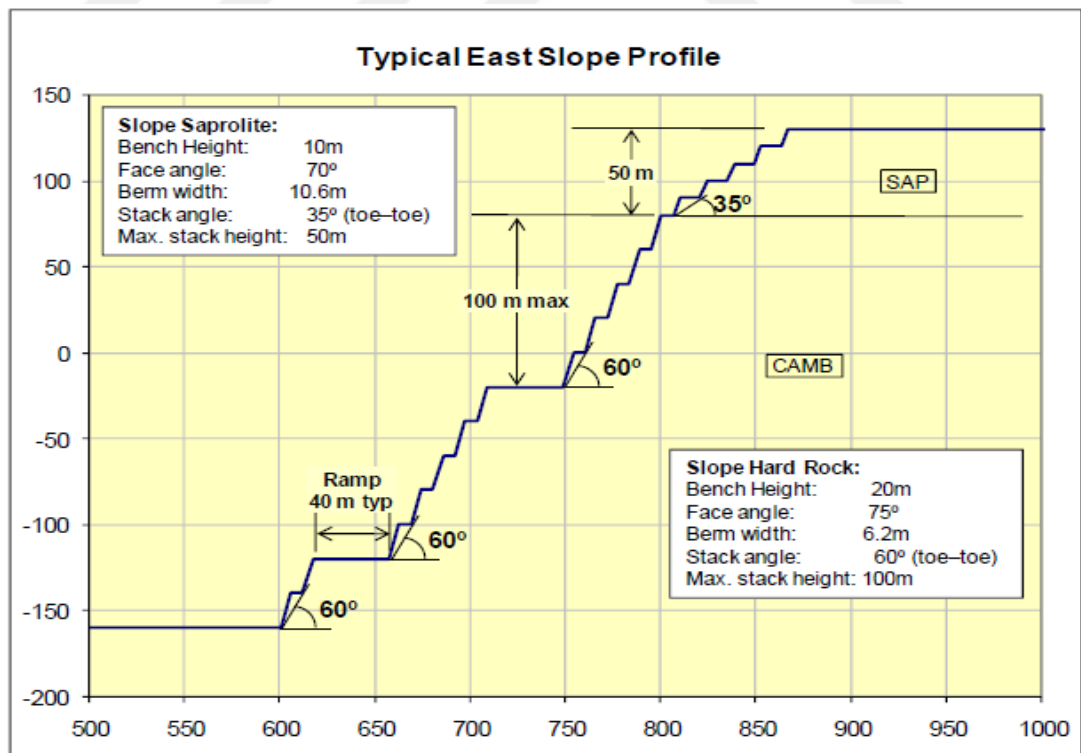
Typical east slope profile with recommended slope angles (SRK, 2009)
